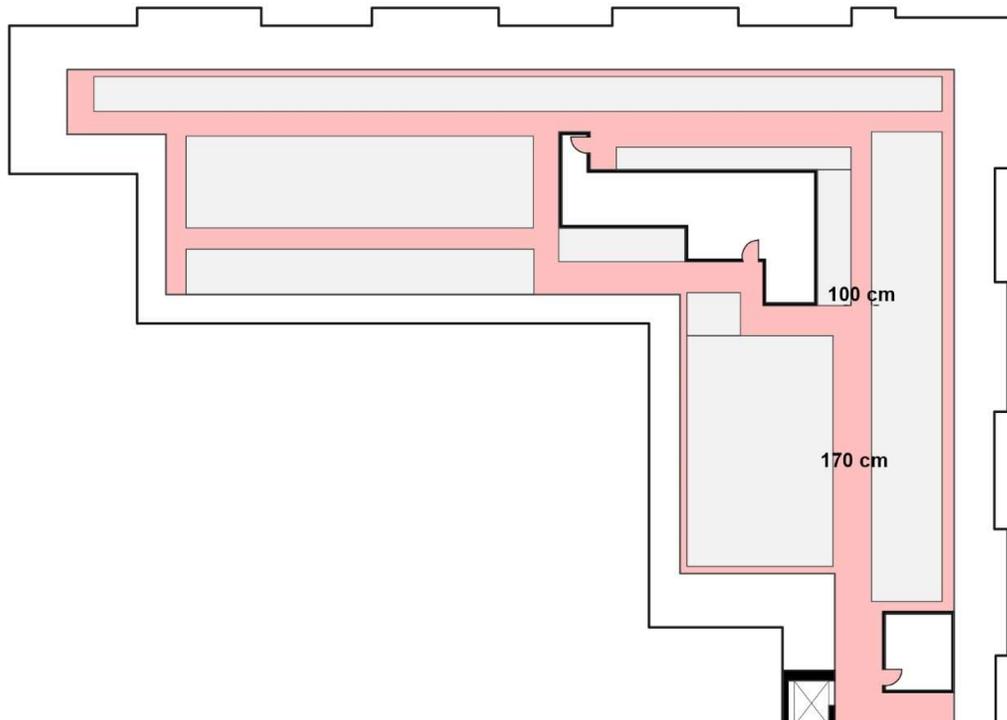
Skyvegetable, rooftop greenhouse planimetry, horizontal connection in red, drawing by Maicol Negrello
